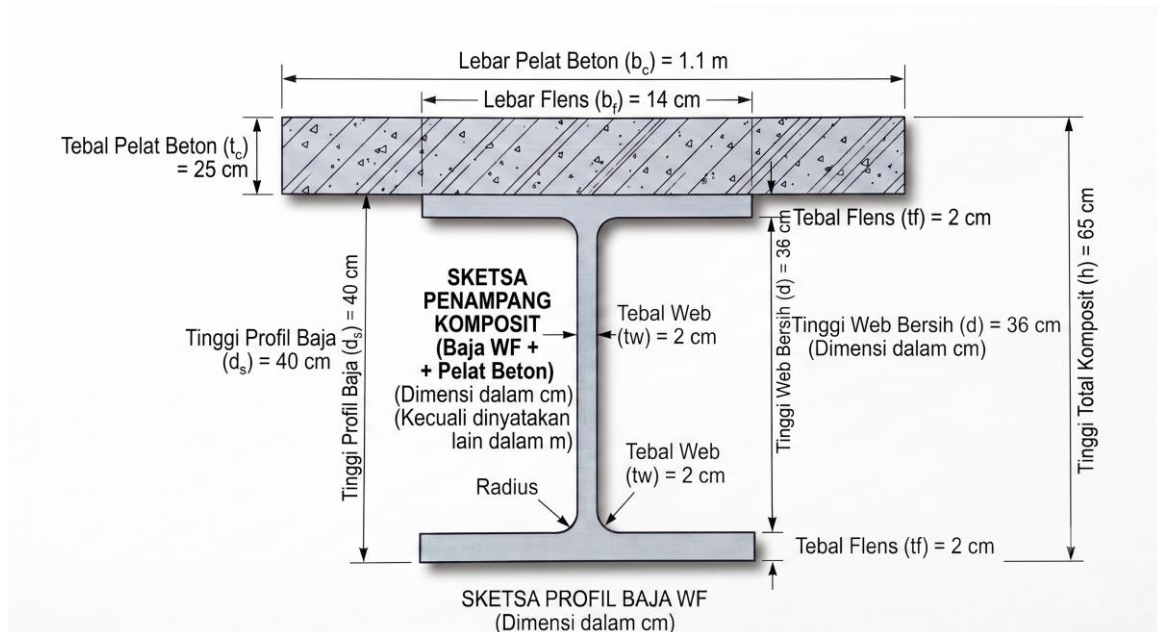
Composite-section sketch (WF steel section and concrete slab) of Brai 2 Bridge; dimensions in cm.
